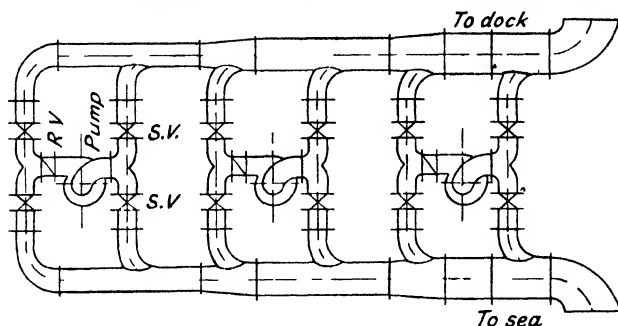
Arrangement of pumps and conduits, etc., in dock pumping plant.
